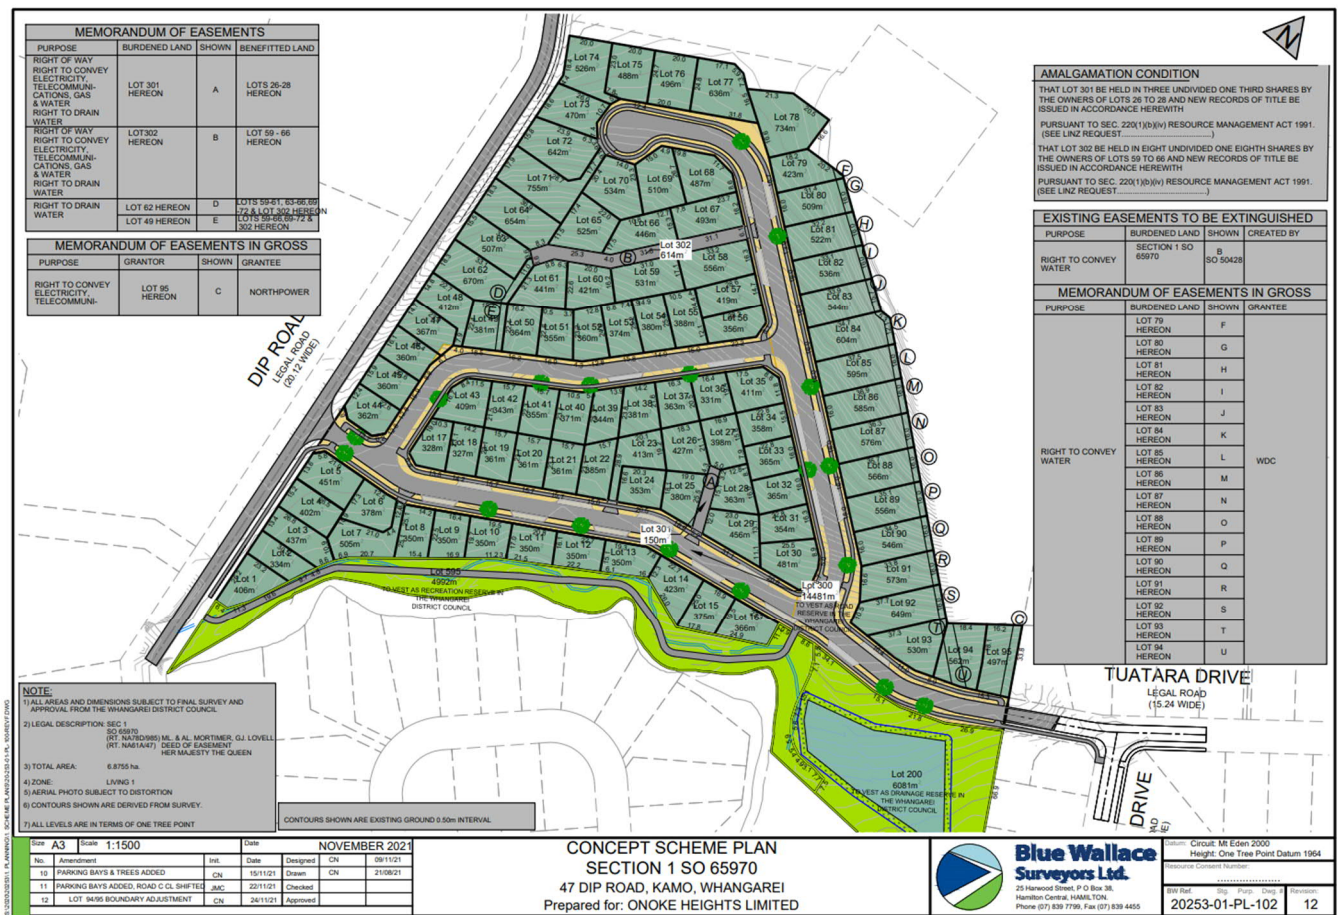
Proposed scheme plan provided by Blue Wallace Surveyors Ltd.
